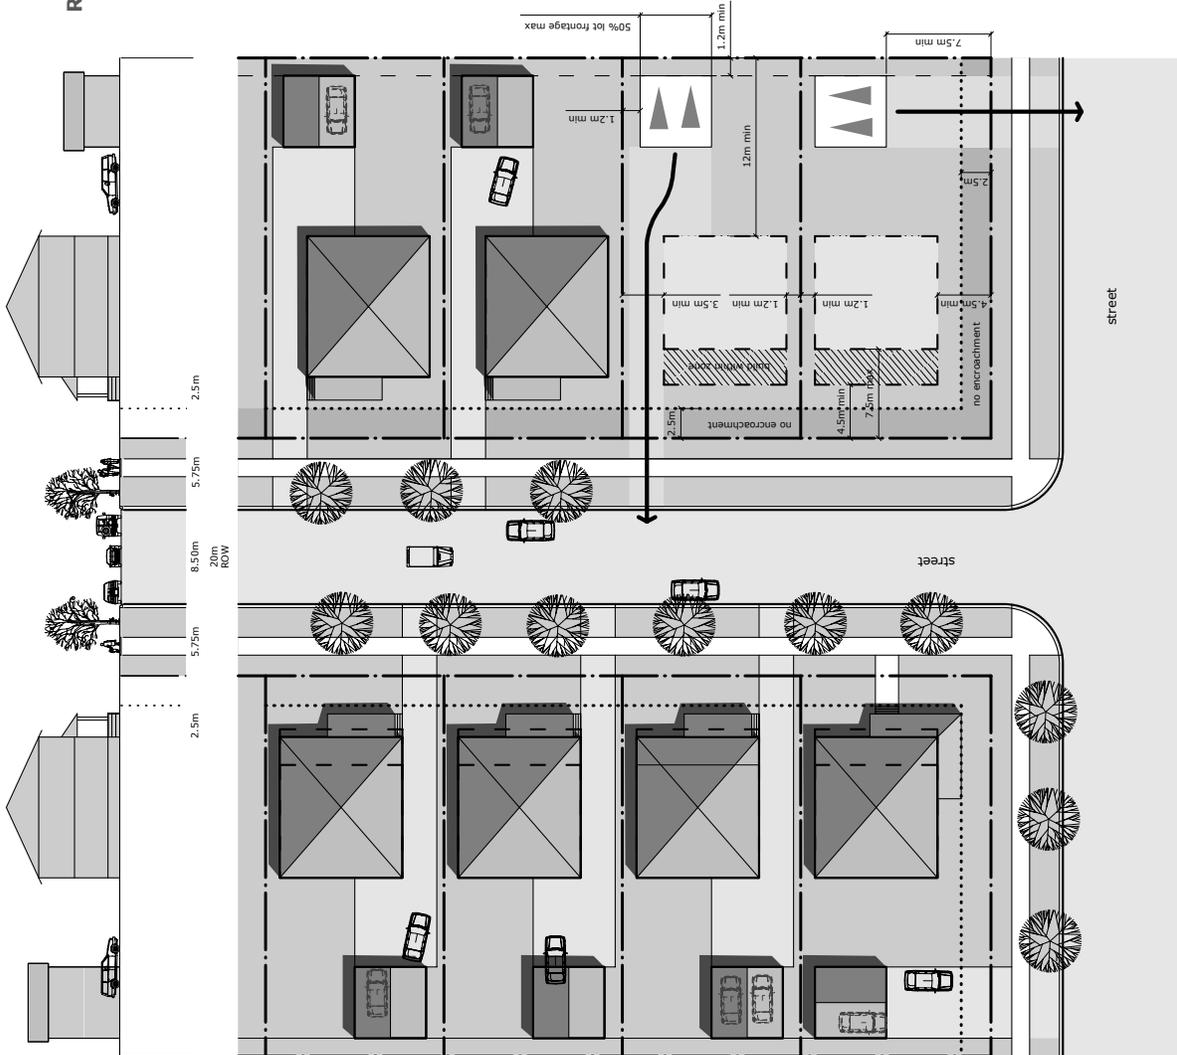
Single Detached House with Detached Garage Accessed via Side Yard
